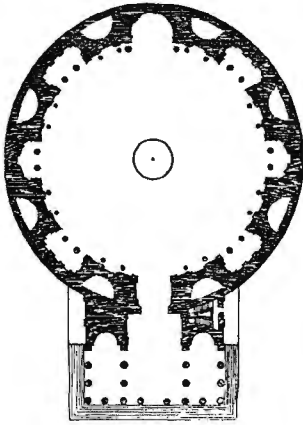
Serlio. Third Book: Plan of the Pantheon.
